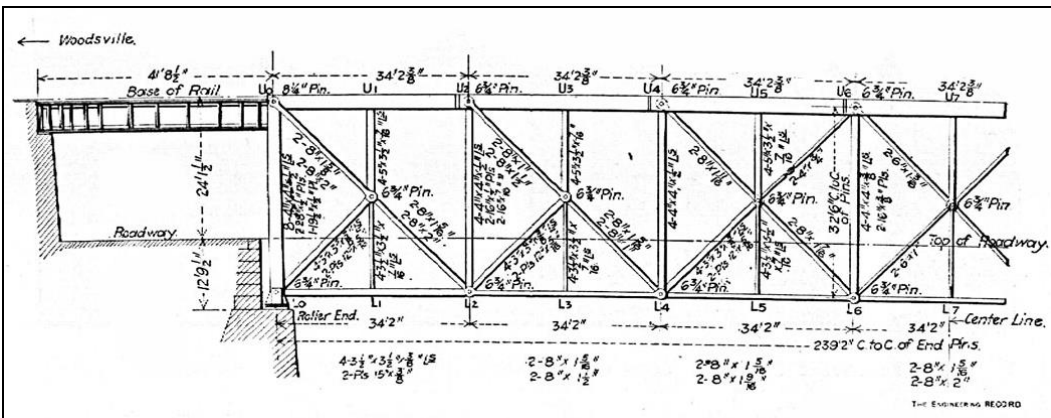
Boston & Maine Railroad double-deck bridge, railroad over highway, built 1904, destroyed by ice jam, 1922, due to faulty foundations (*Engineering Record*, 1904).
